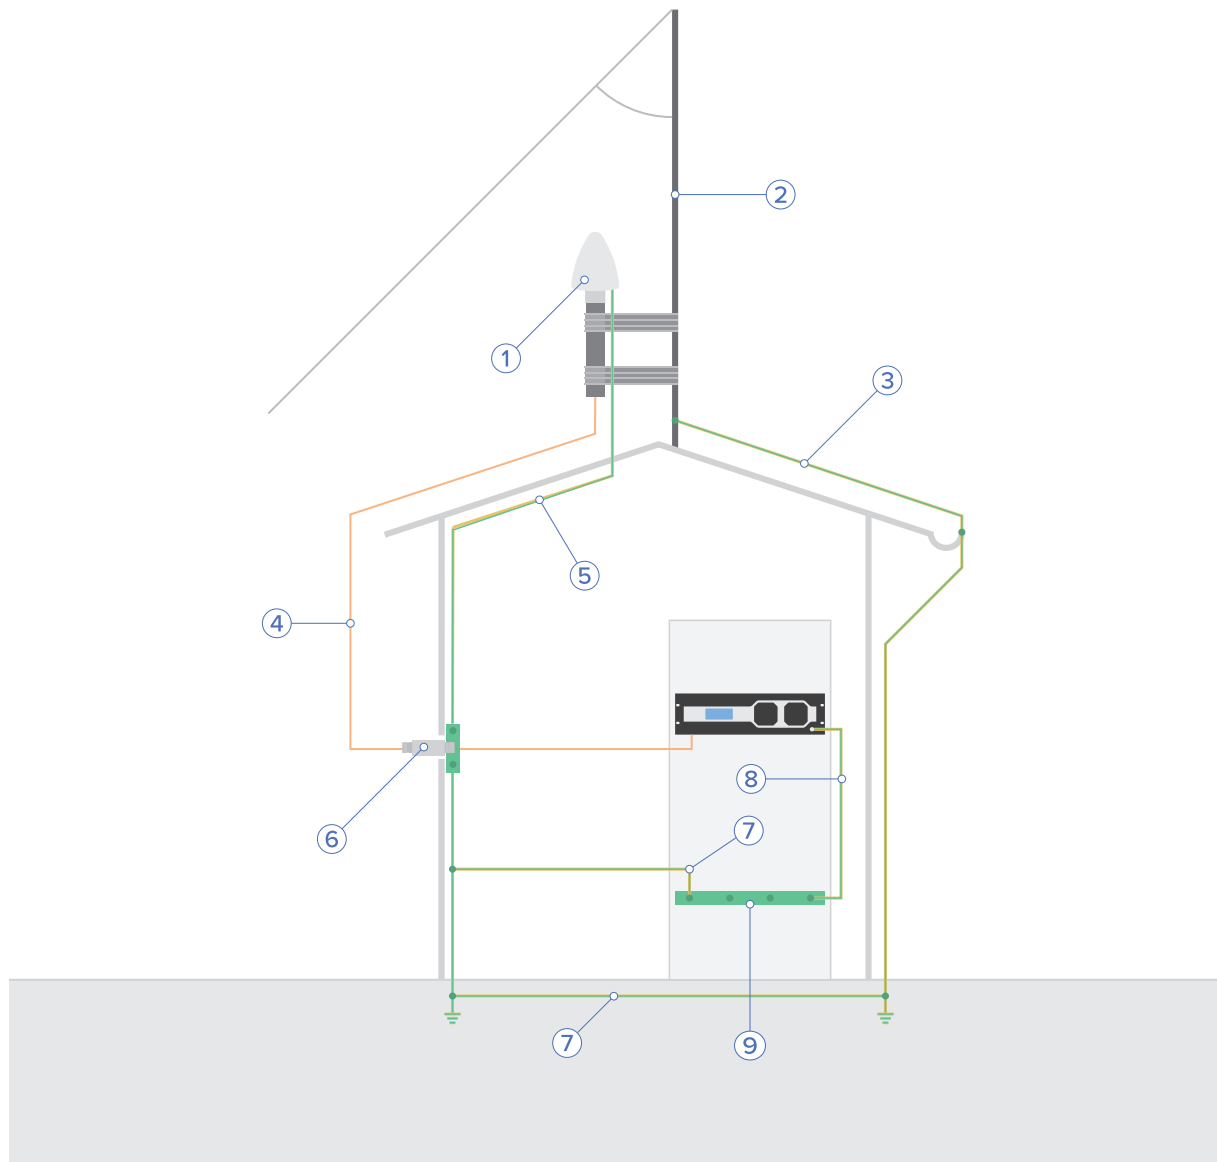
Grounding of a Roof or Wall-Mounted Antenna
